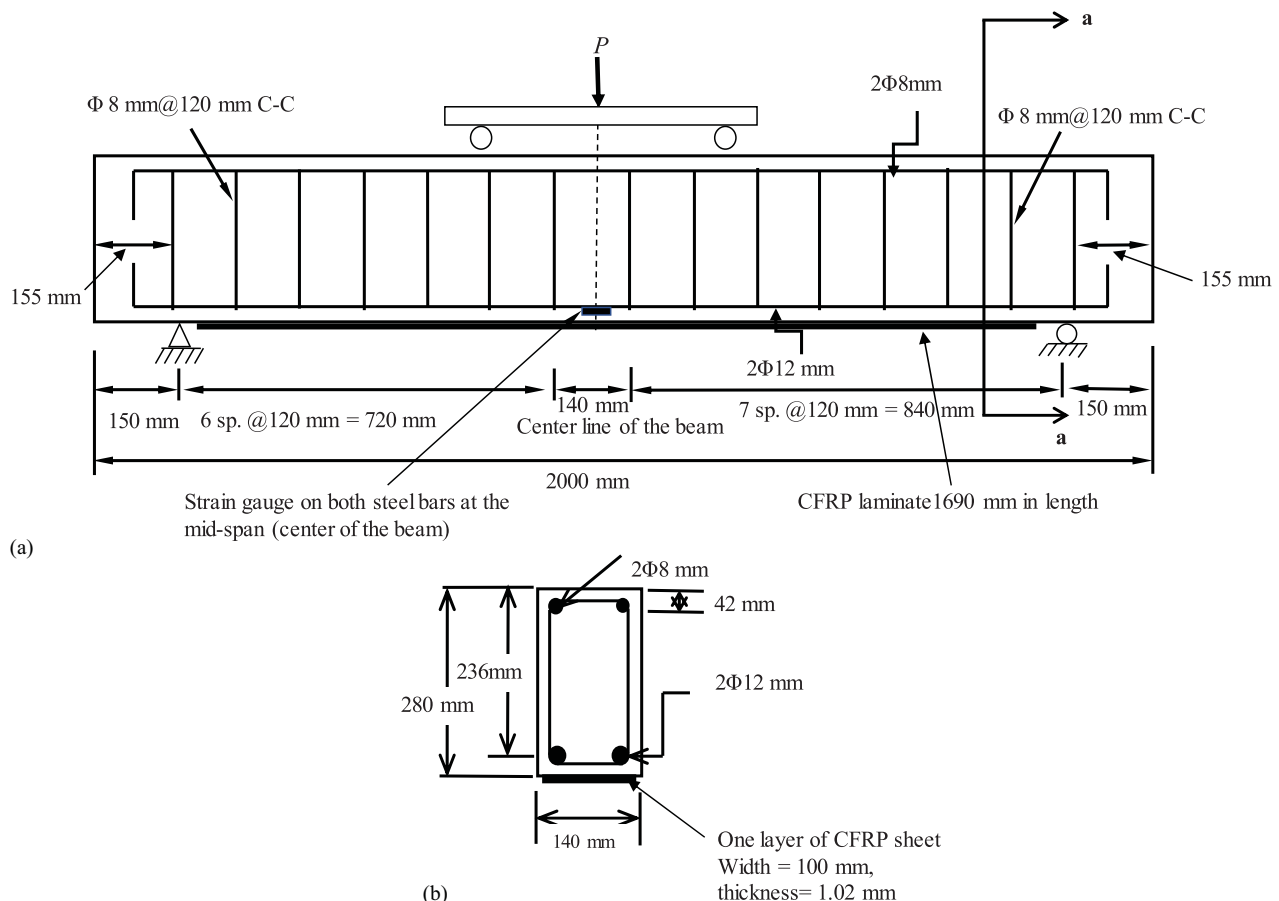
Dimensions of typical-scaled concrete beams with reinforcement detail: (a) front view; and (b) cross-sectional view.
